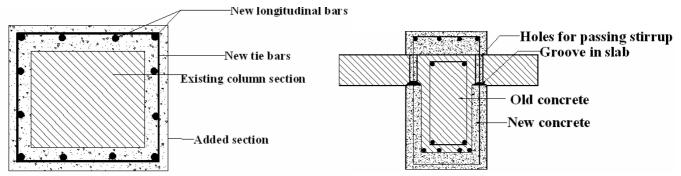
Strengthening Techniques for Existing Non-Engineered RCC Buildings
